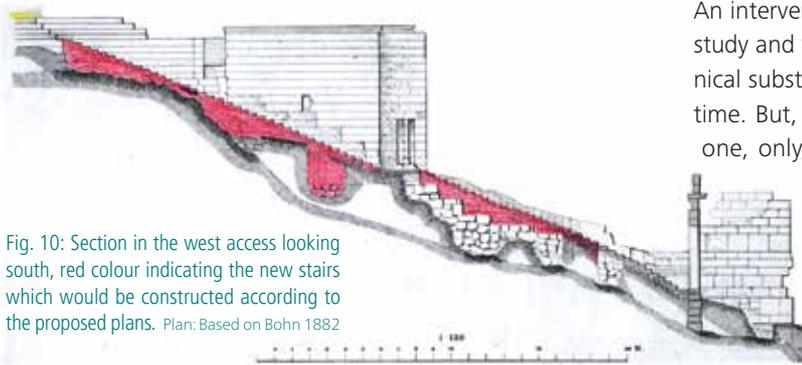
Section in the west access looking south, red colour indicating the new stairs which would be constructed according to the proposed plans. Plan: Based on Bohn 1882
